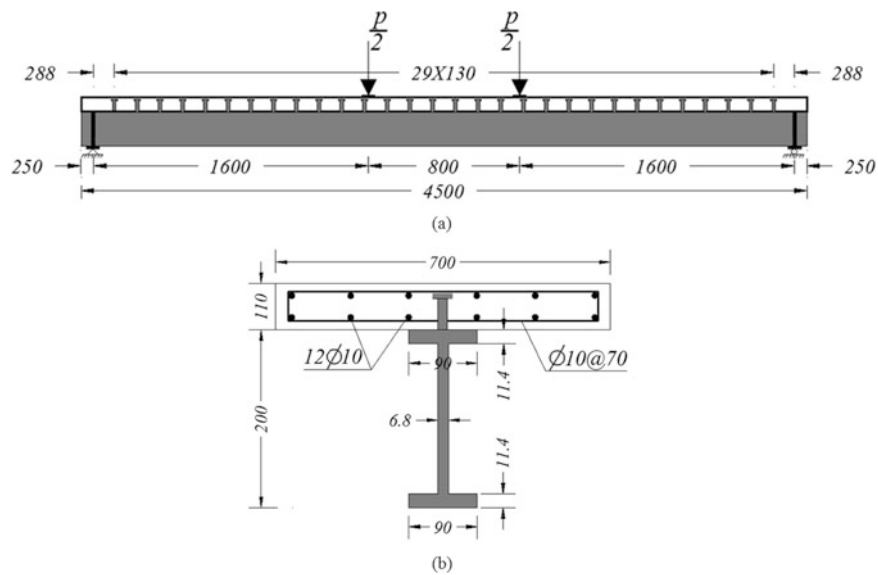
Details of the tested specimen FSCB-2: (a) beam elevation and (b) beam cross-section
